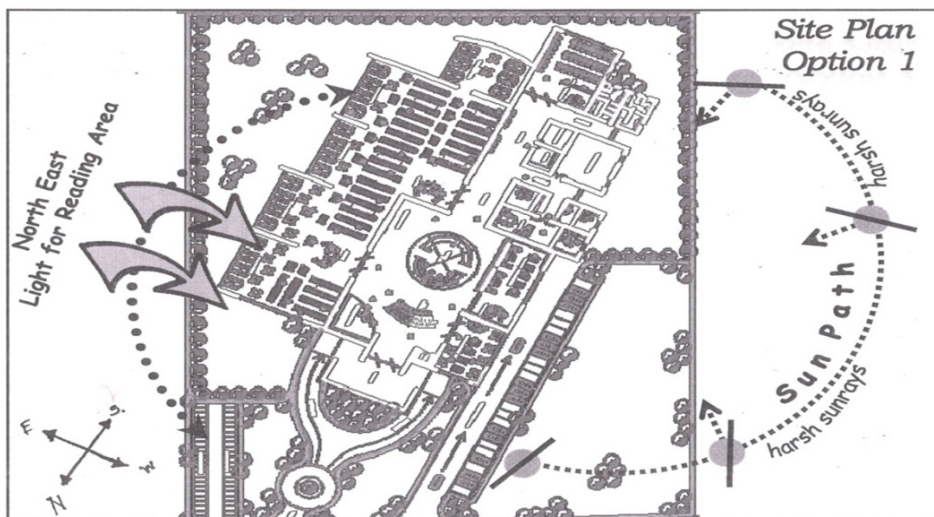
Site Plan of New Library Building at SVNIT Surat
